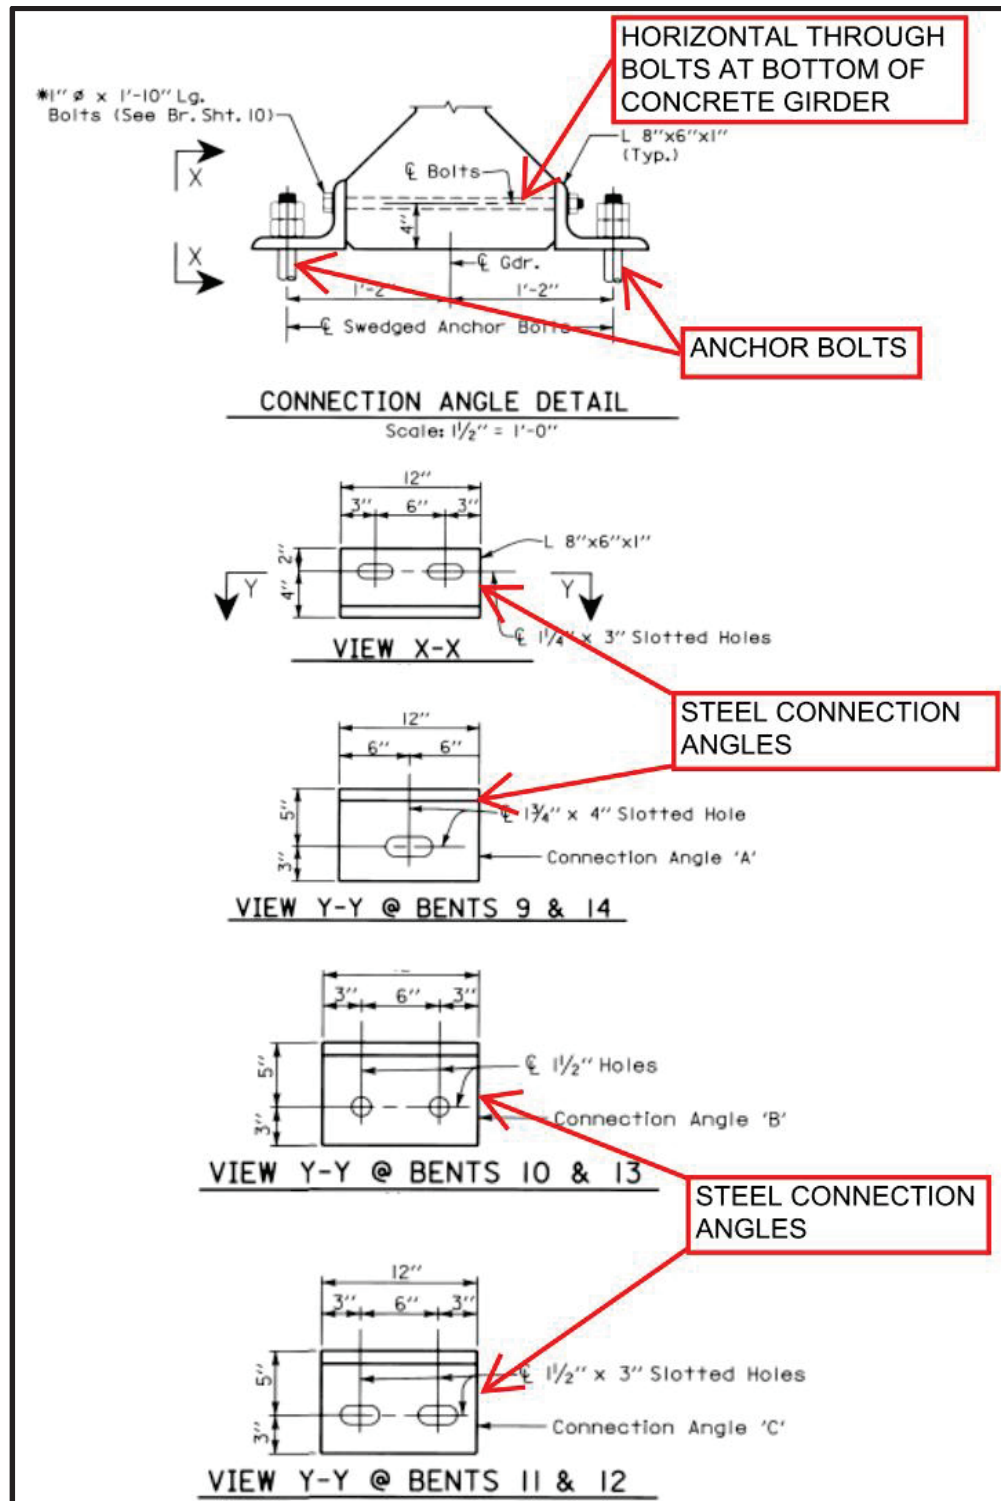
Steel Connection Angle and Bolt Details between Bents 9 and 14 on the Bridge to I-10 Eastbound at Exit 30²⁴⁶²⁴⁶ Source: ALDOT, 2006 (as modified)
